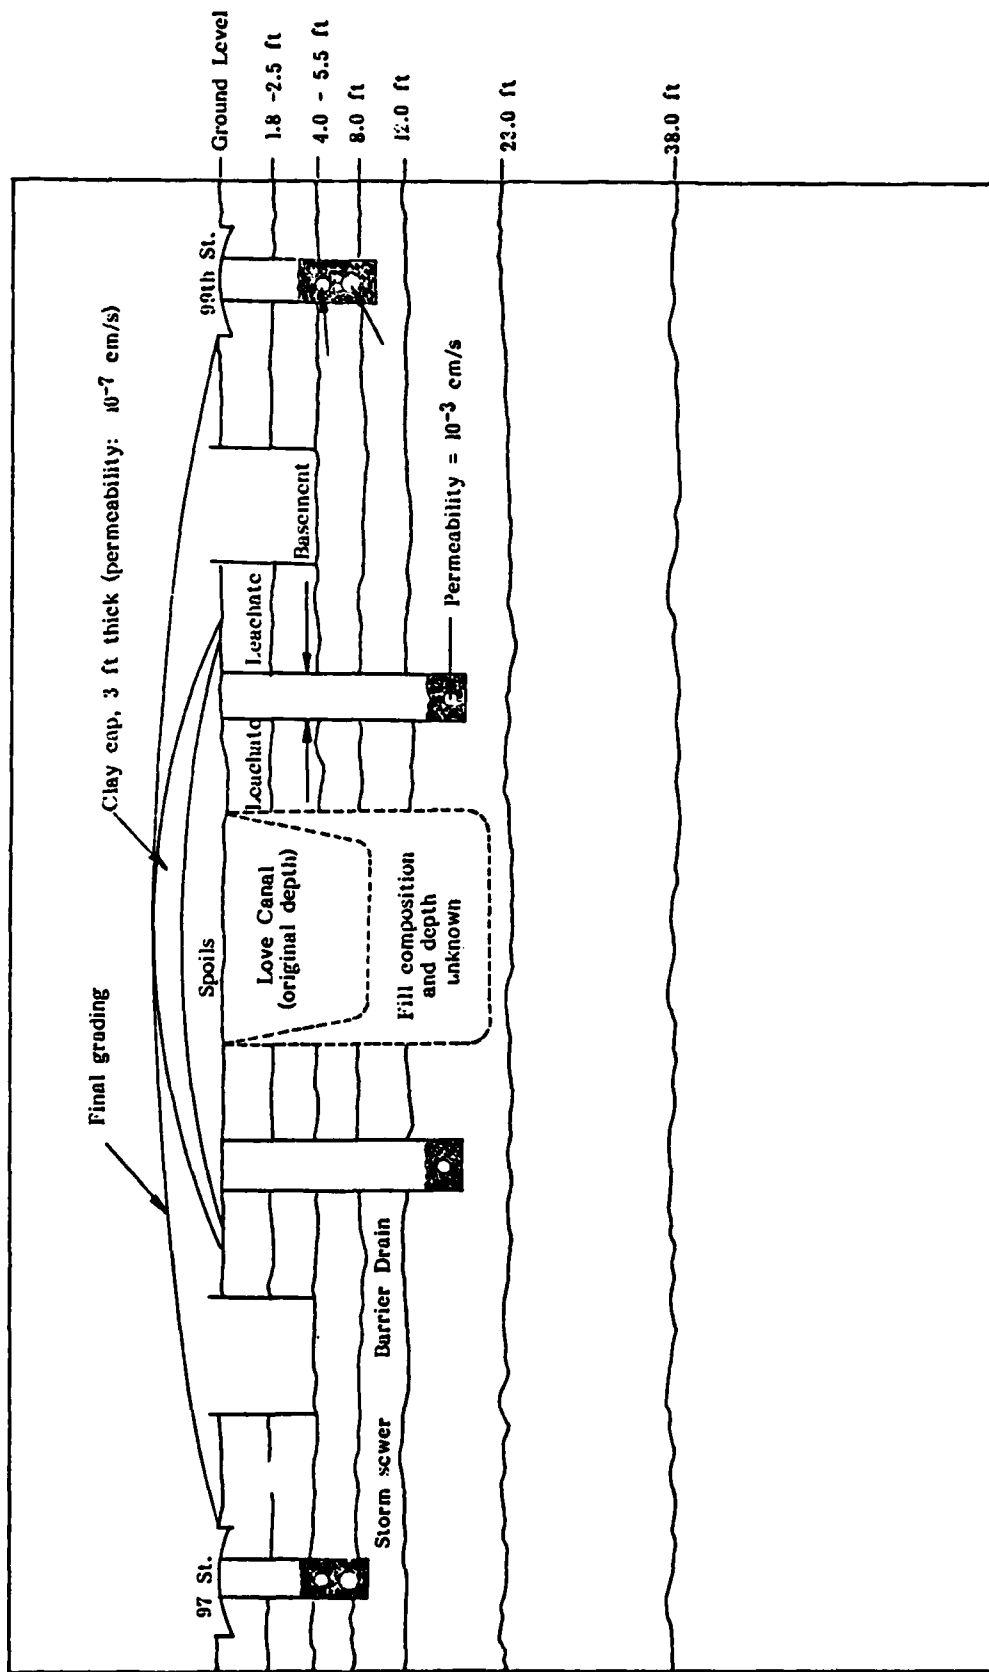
Underground Leachate Collection Drains at the Love Canal (Glaubinger et al., 1979)
